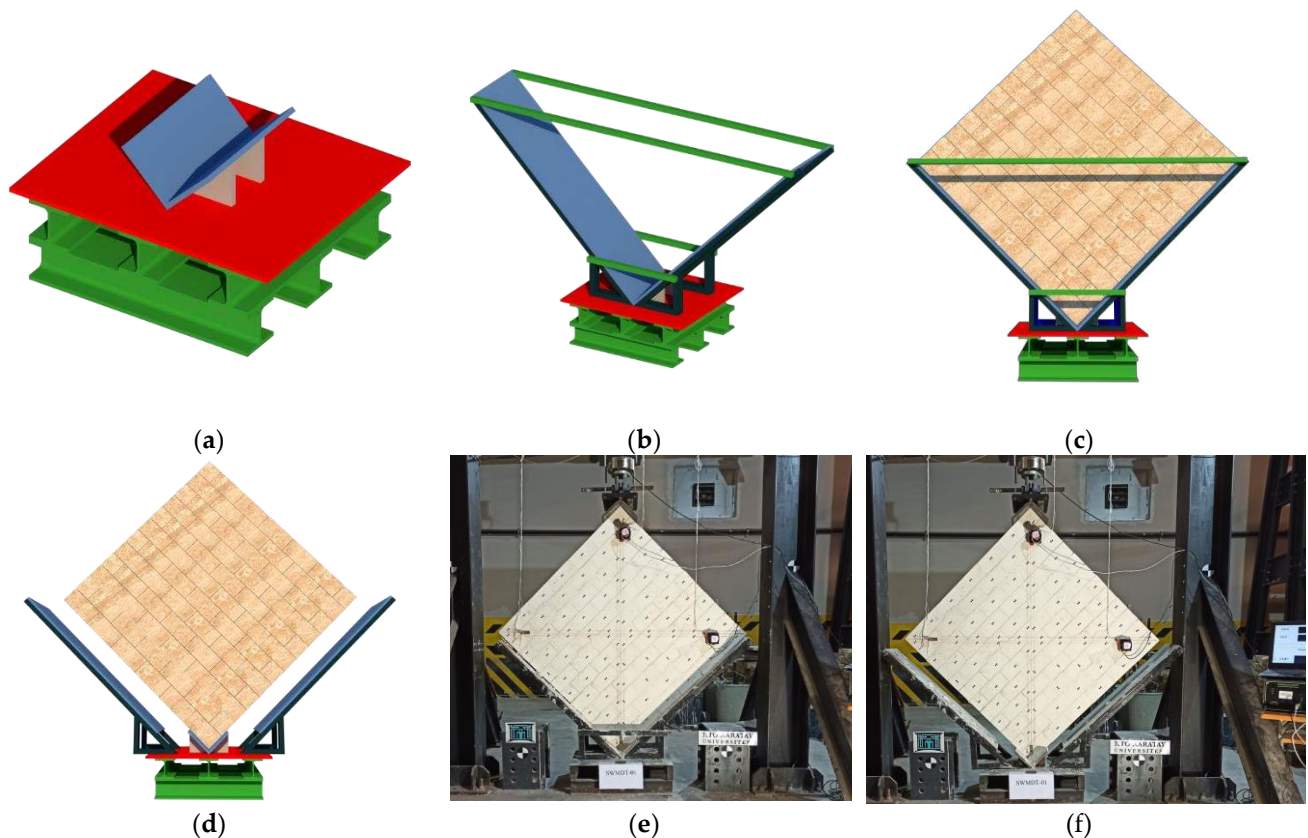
Diagonal specimen platform following ASTM E519: (a) V-head platform; (b) V-head Platform + wall brackets; (c) Wall specimen during curing and transport; (d) Wall specimen during the test; (e) Diagonal compression test setup (before the experiment starts); (f) Diagonal compression test setup (after the experiment starts).
